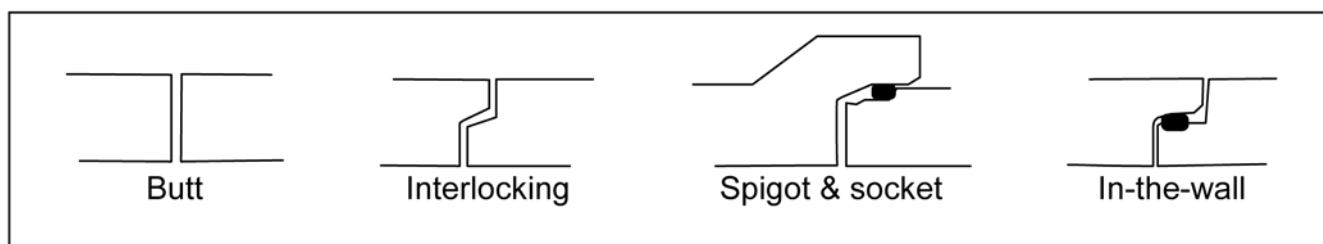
SECTION THROUGH DIFFERENT CONCRETE PIPE JOINT TYPES
